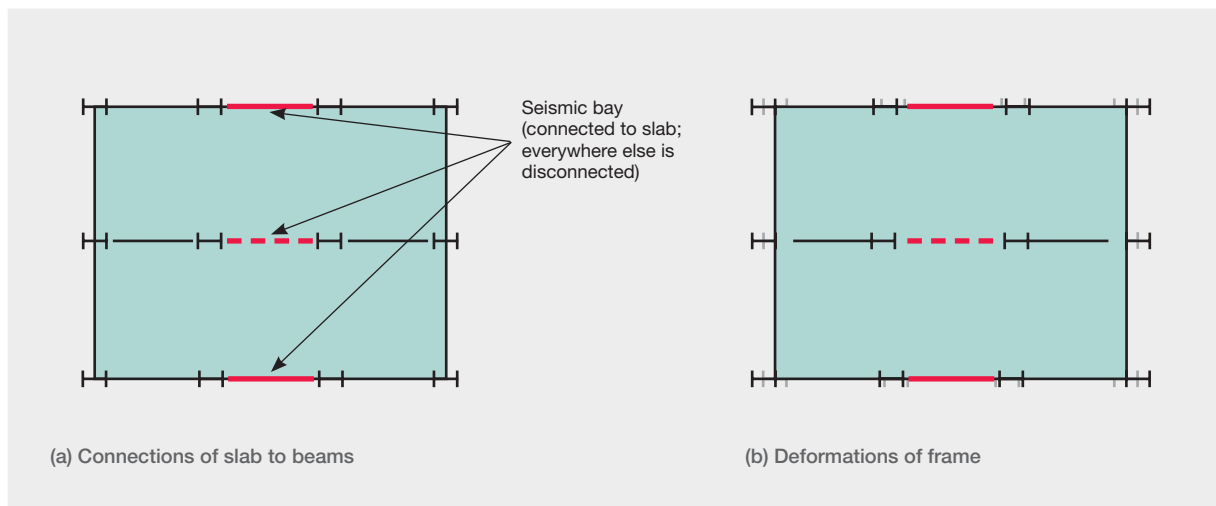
PRESSS technology with slab connected over one bay (source: Buchanan report)
